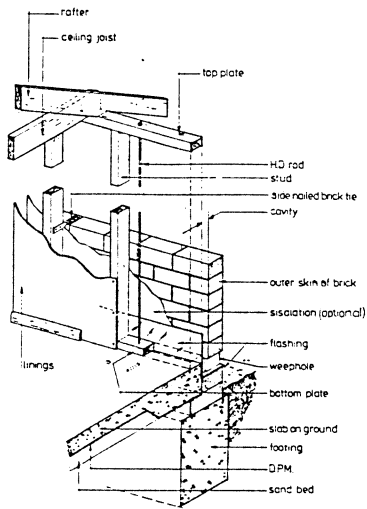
Typical Masonry Veneer Construction [ADCM 1993]
